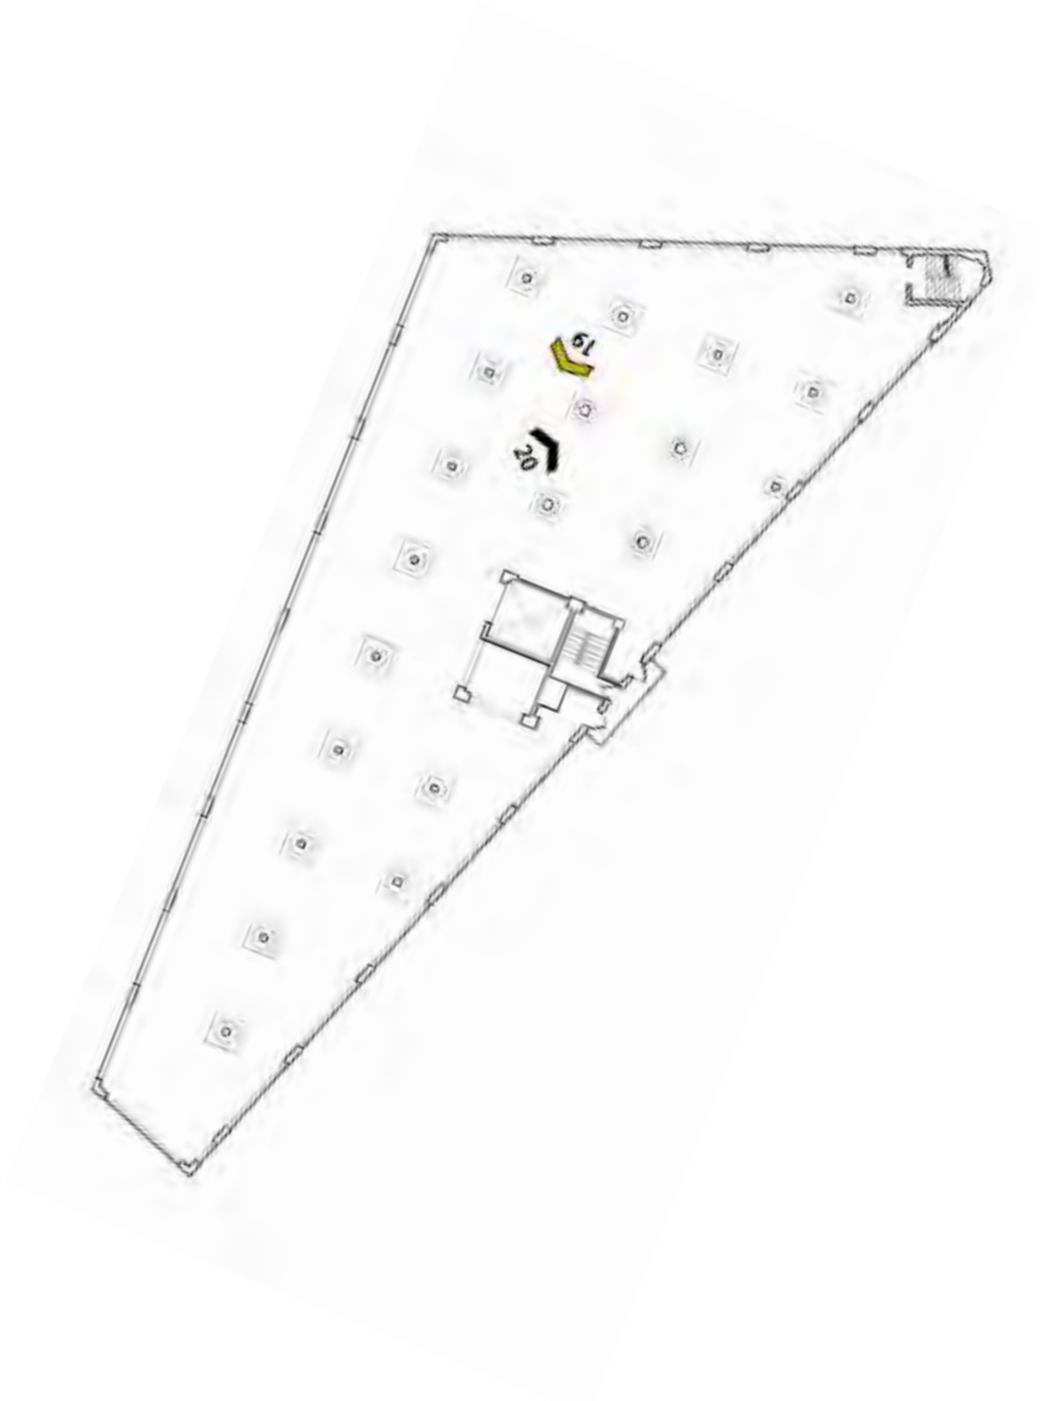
Interior Photo Key, Second Floor; Photos 19-20.
